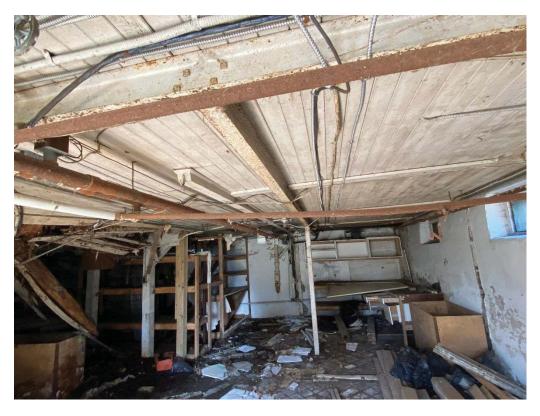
Deteriorated Basement Roof and Stone Foundation Walls
